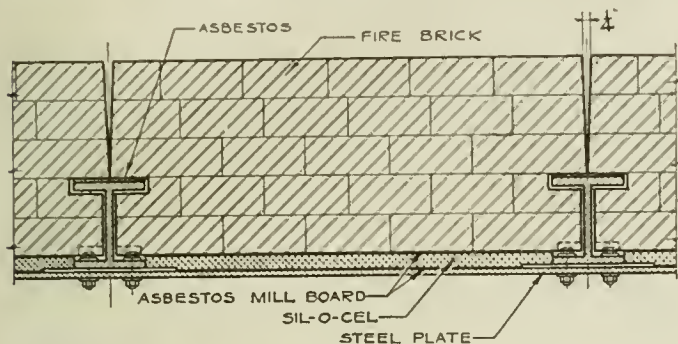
PLAN OF FURNACE WALL AT HELL GATE STATION, UNITED ELECTRIC LIGHT & POWER CO.
